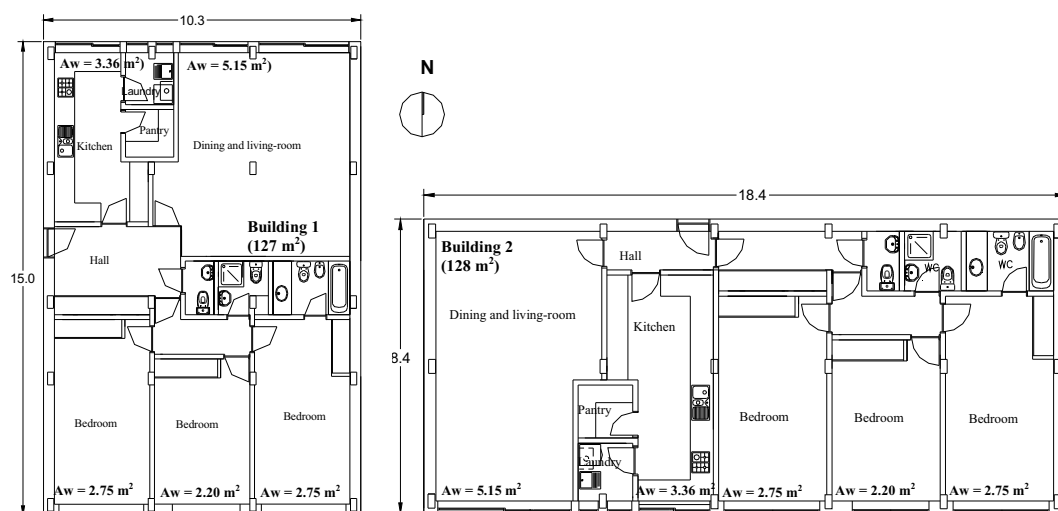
Schematic plan of the studied buildings (Aw – area of the window).
